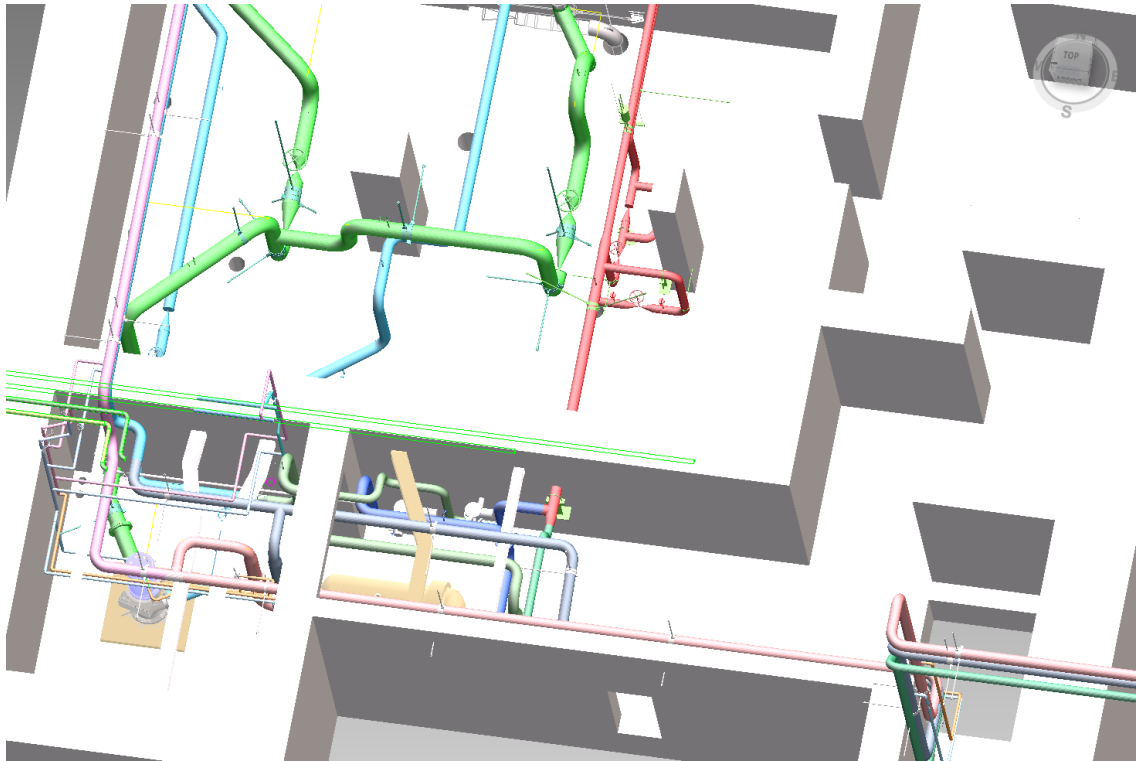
Ground plan of the AB el. 89, showing new piping and major equipment (PMP, HEX) – look from plant south side
